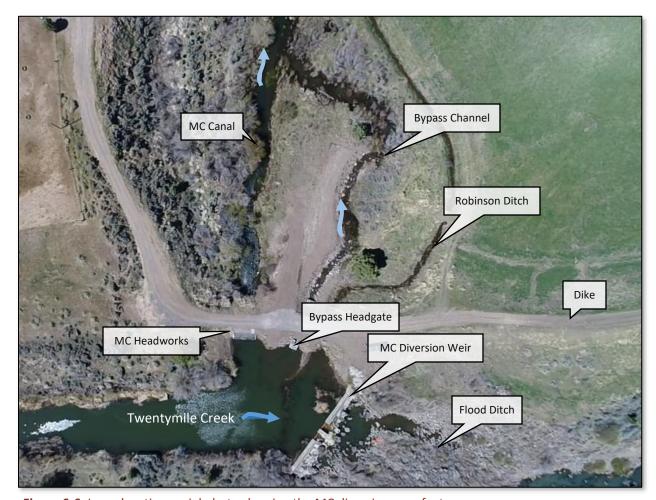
Low elevation aerial photo showing the MC diversion area features.
